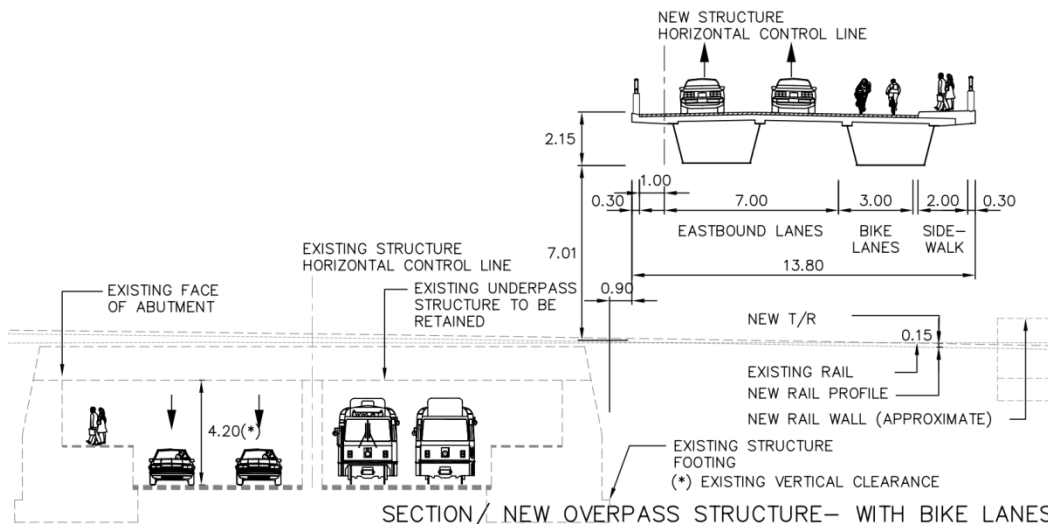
Option 1(B)(ii) - Profile at New Underpass Structure
